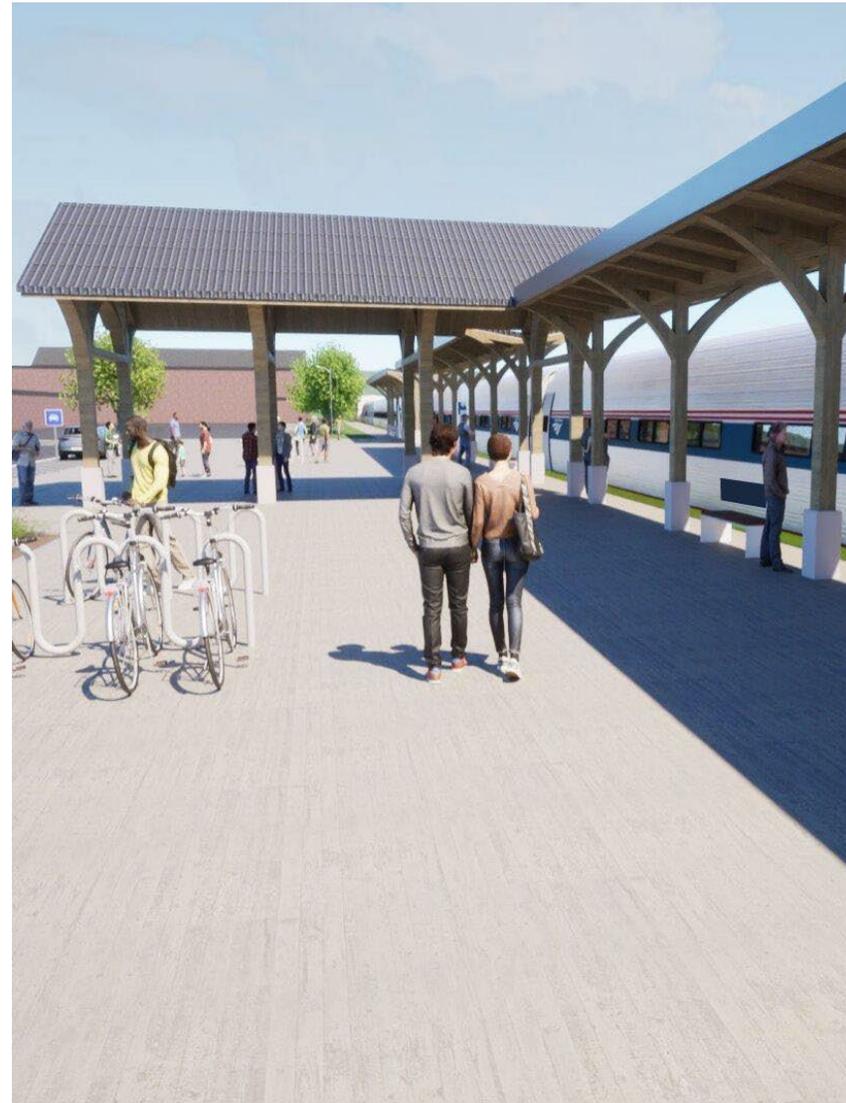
Rendering of the Passenger Pick-Up/Drop-Off Area without the Potential Building
